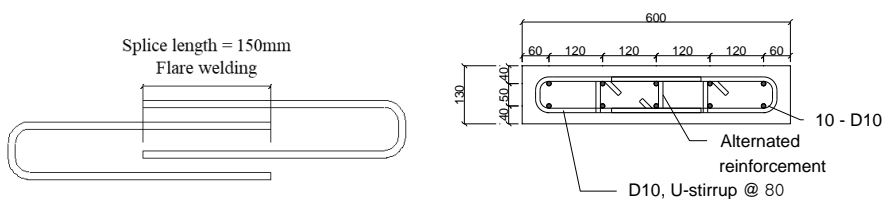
Details of wall boundary in the test specimens (unit:mm)
